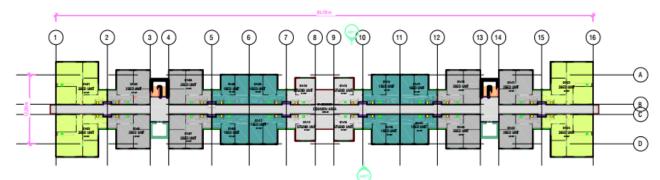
Affordable Unit Typology – Alternative Linear Floor Plan, Mixed Block
